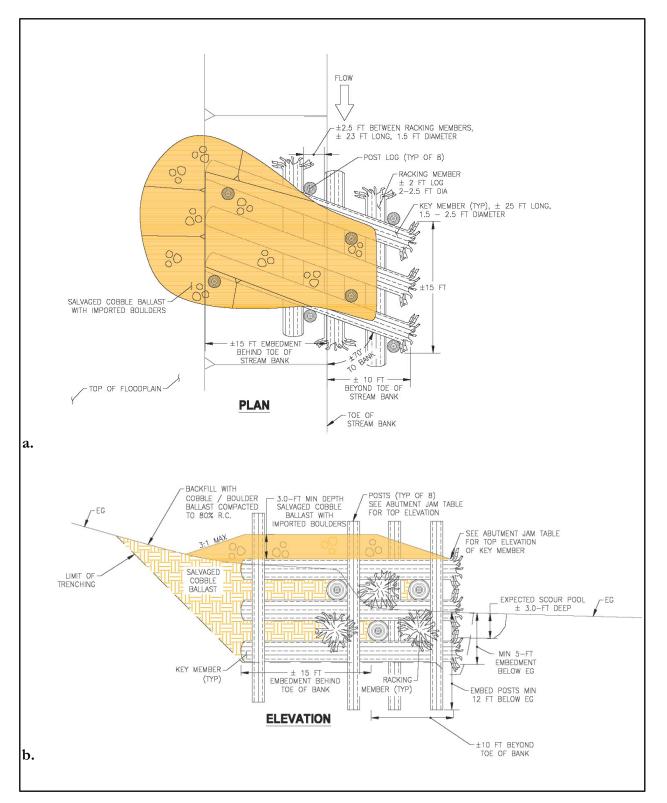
Design drawings for an Abutment Jam in (a) plan and (b) section.
